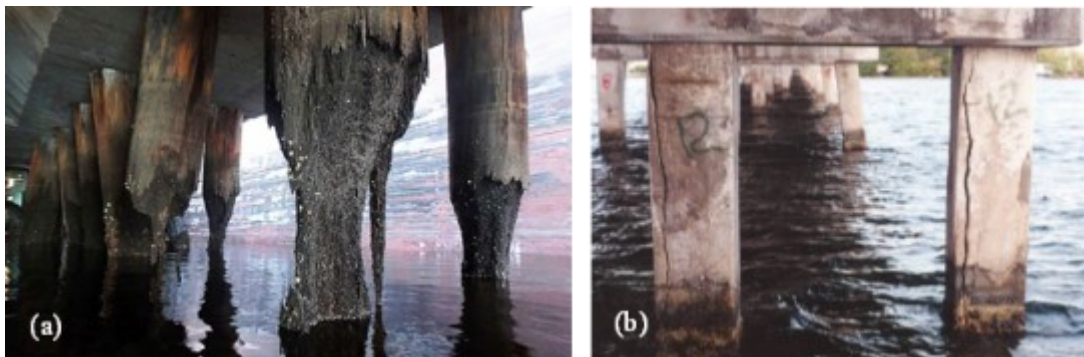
Environmental impact on marine structures: (a) Worn out timber piles (QuakeWrap Inc.); (b) Typical corrosion of precast prestressed concrete piles (Moser et al., GODT 2011)
